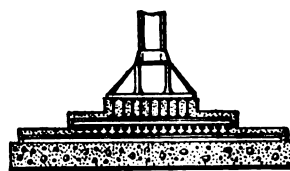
COLUMN FOUNDATION OF STEEL RAILS AND I-BEAMS IMBEDDED IN CONCRETE.
